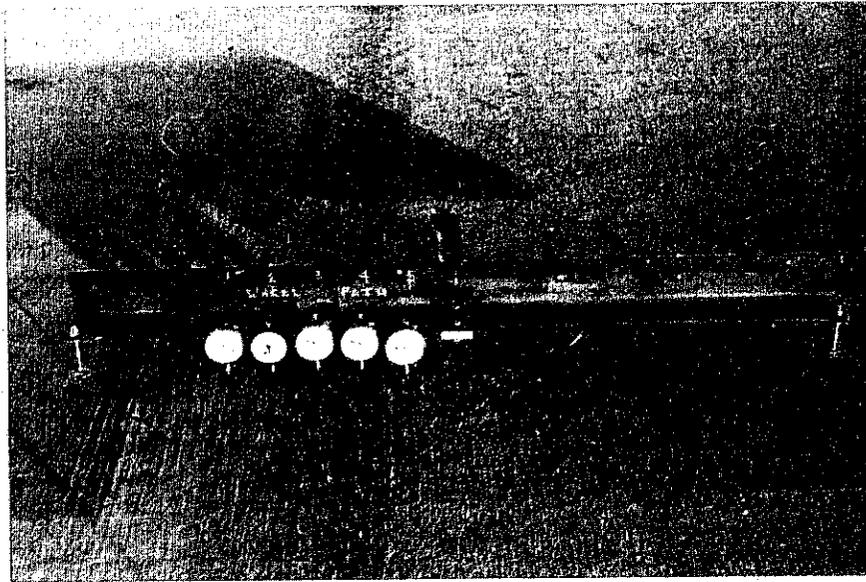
The beam used to measure pavement surface depression in the wheelpath at each test site.
